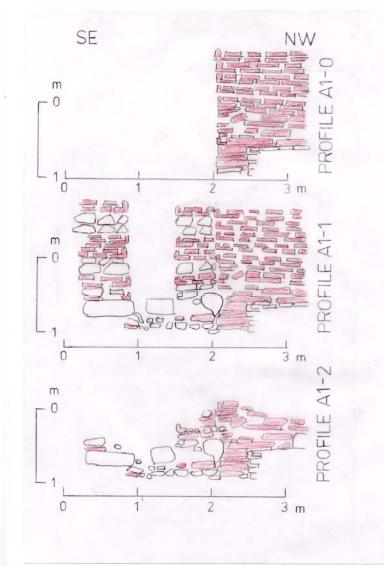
Present profile A1-2 (see fig. 1) at the entrance leading into the B.CH. (seen from church). One can see steep leading into the church, wall built of bricks with edge (left side) and rest of wall built of stone and plate bricks (separating apse of church from rest of church).
